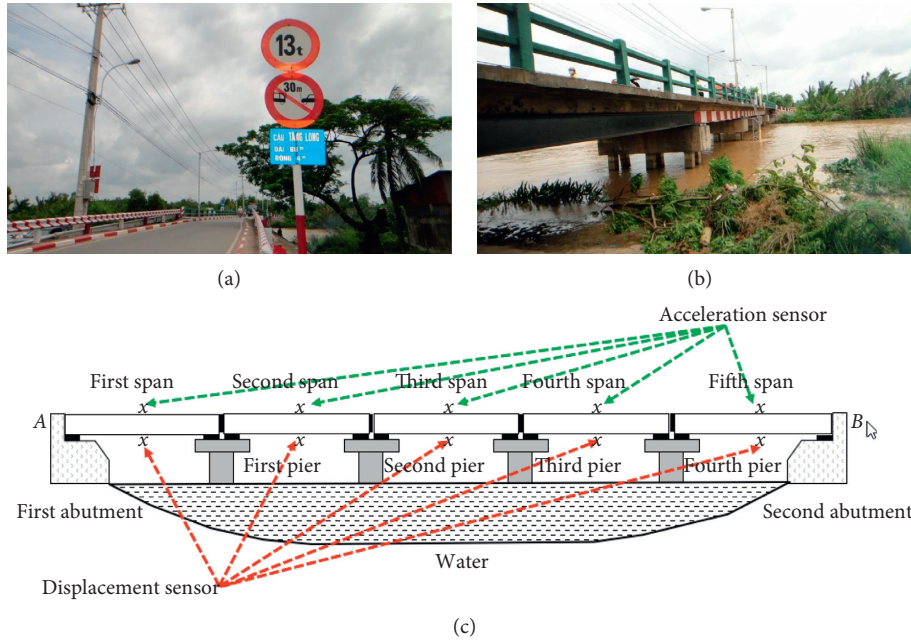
Actual model and longitudinal section of Thang Long Bridge.
